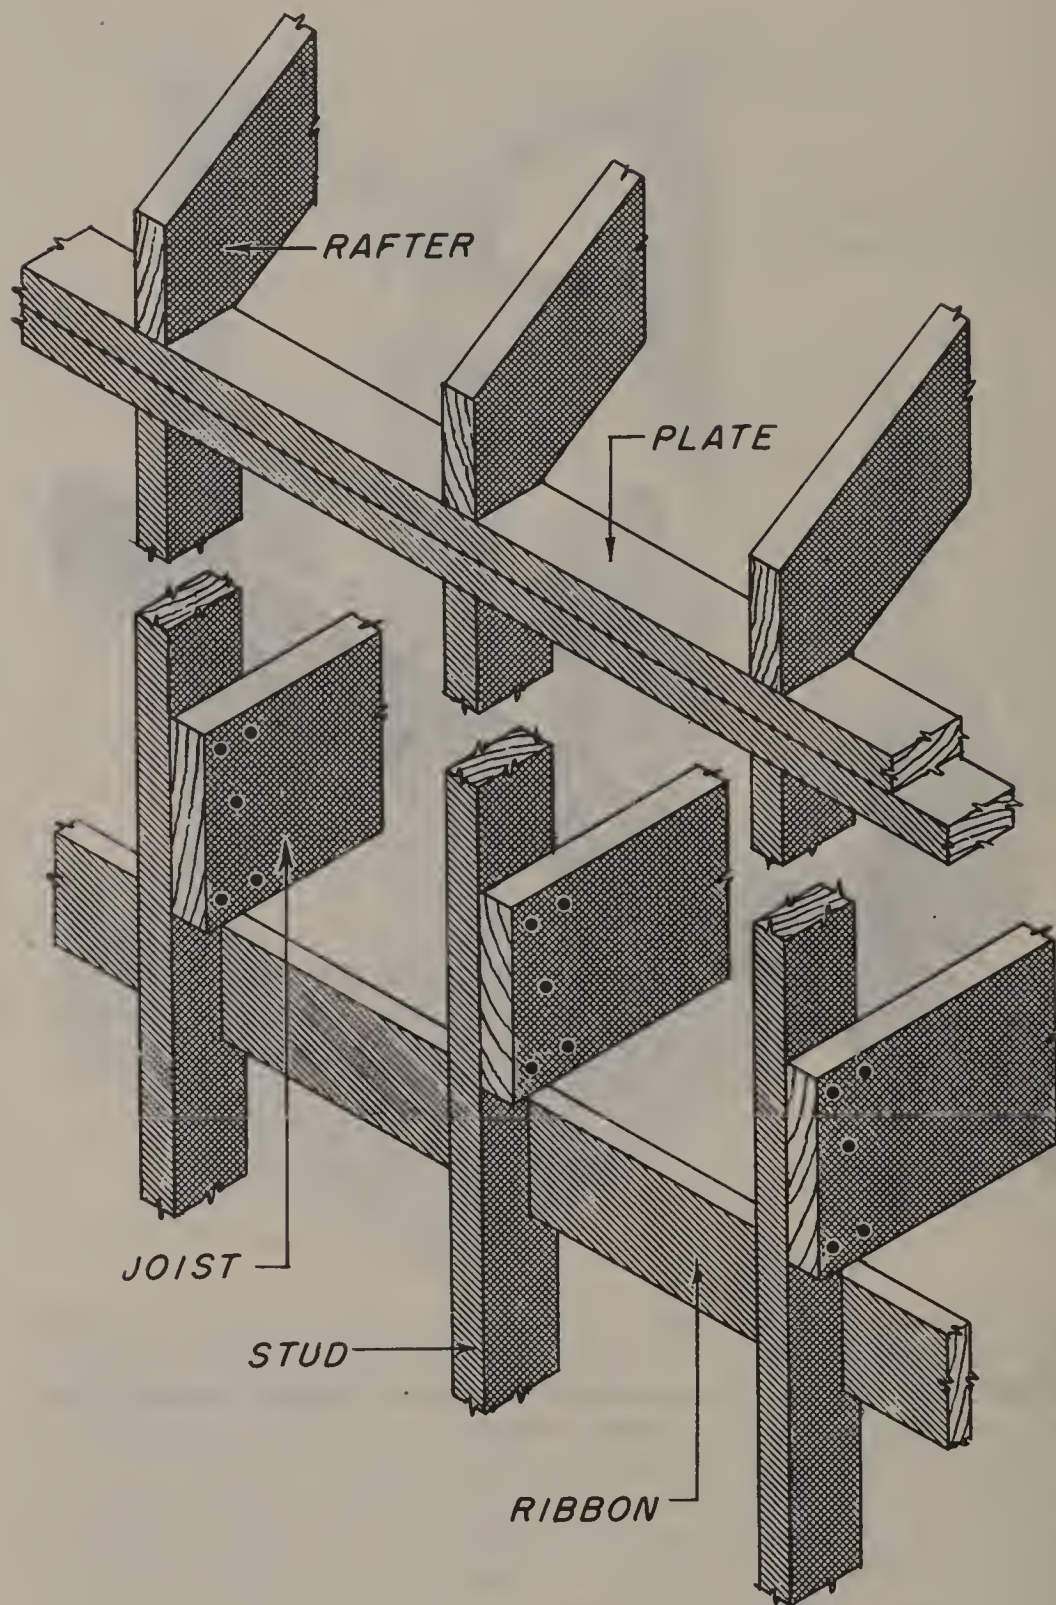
Joist bearing on ribbon. Joist nailed to each stud with five tenpenny nails. Note: When there is a full story above ribbon, two instead of five nails will be sufficient since ceiling joists will then be available to resist the thrust of rafters.
